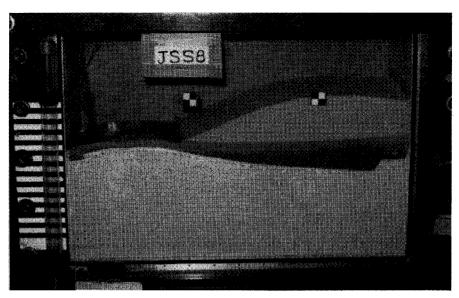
Failure of an unreinforced embankment (test JSS8).
